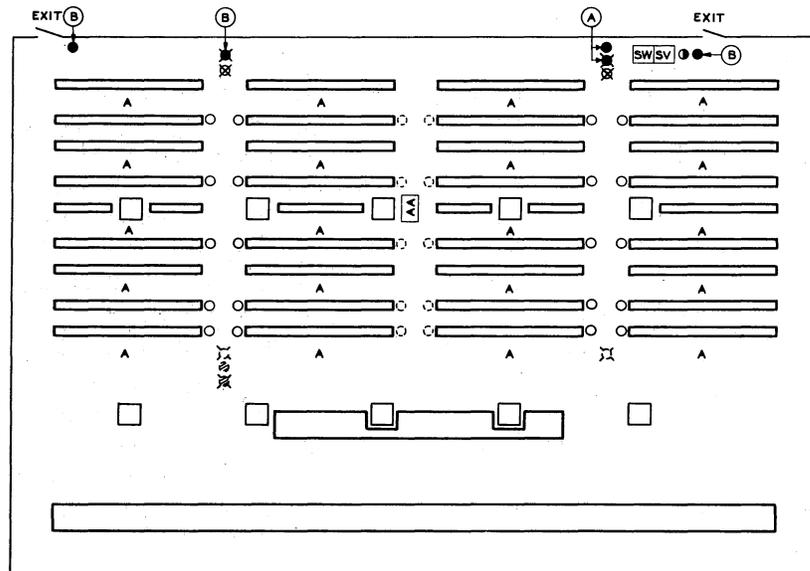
Typical Audible and Visual Alarm Equipment in Office With Several Cross-Aisles—Terminal or Switchroom
